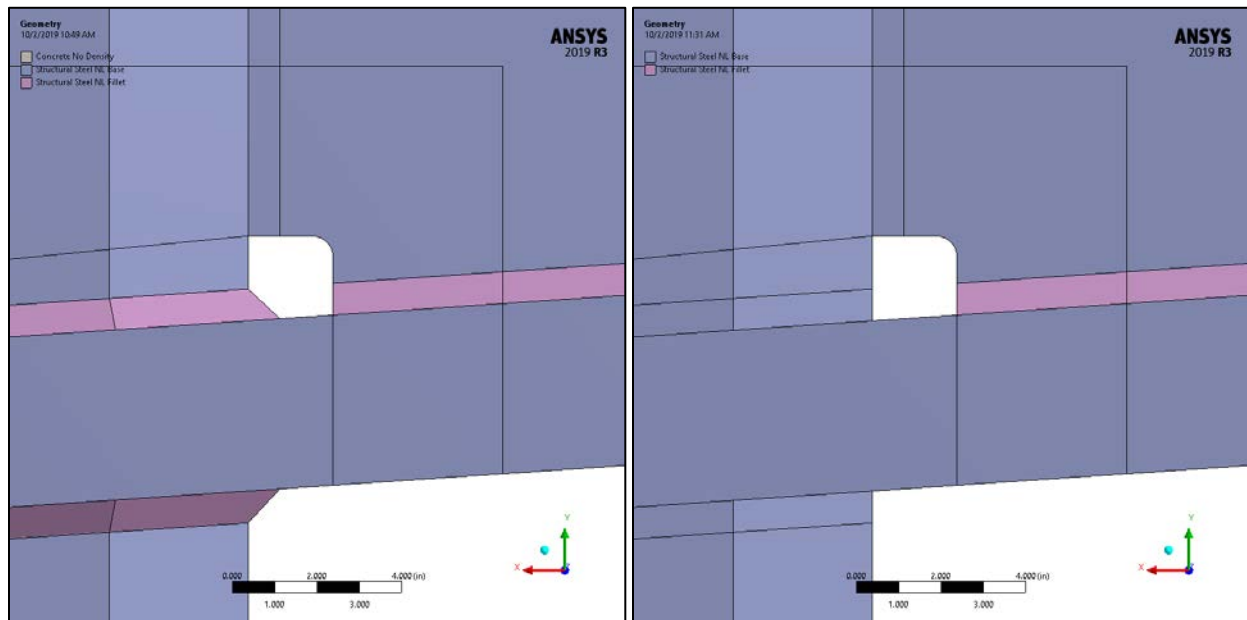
As-built geometry (left) and removed fillet welds (right).
